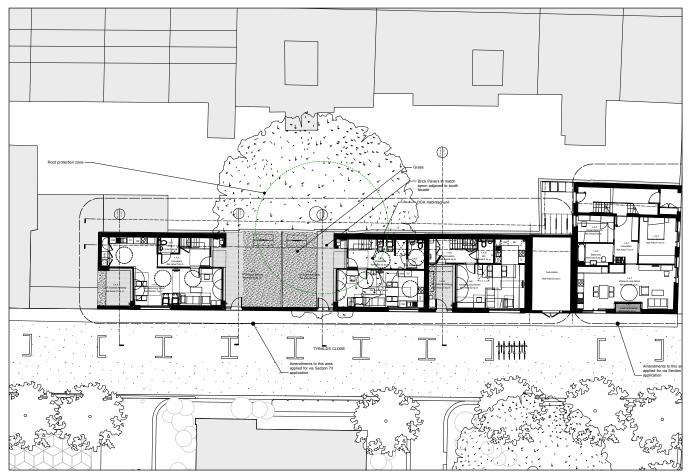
Proposed ground floor showing encroachment on tree 18 root protection area
